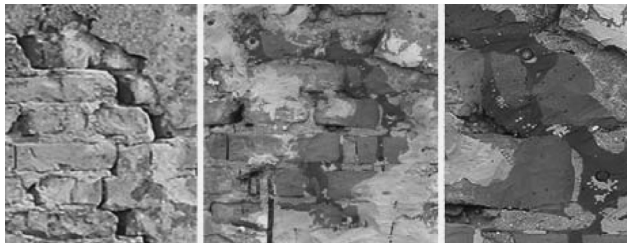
Cracked masonry wall with the polymer mass injection
